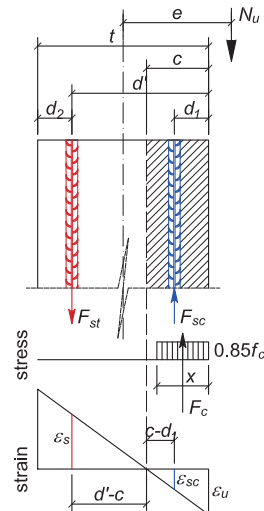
Forces acting on the cross-section of a wall at equilibrium.
